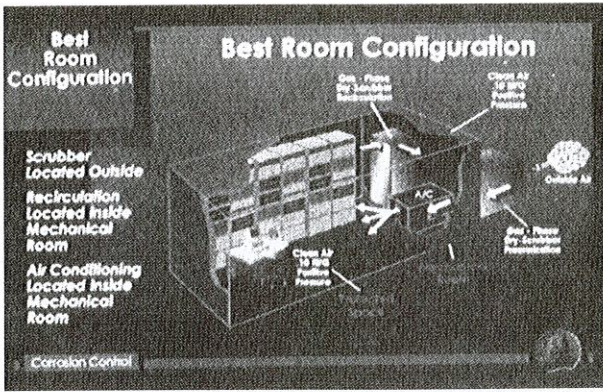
Control room layout, using pressurization and circulation, with air-handling equipment located in outside contaminated air.
